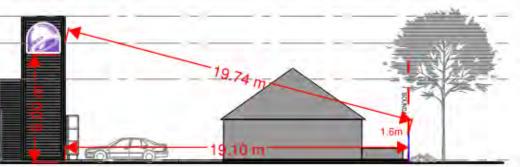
Southern Façade measurements (shown in Western Façade elevation)
